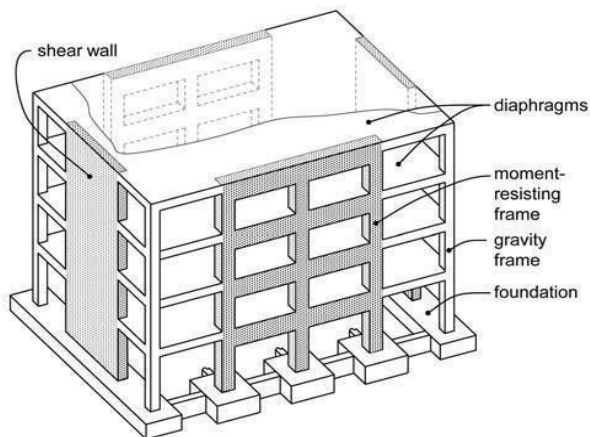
An isometric image of a fundamental building structural system made up of the base, walls, and frames as vertical spanning elements, and diaphragms as horizontal spanning elements.
